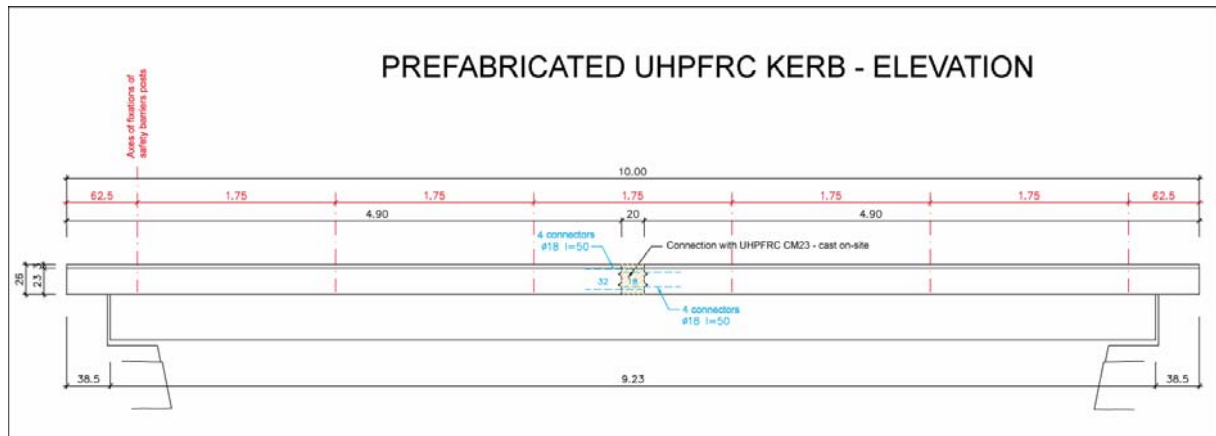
Connection of prefabricated UHPFRC kerb segments, elevation
